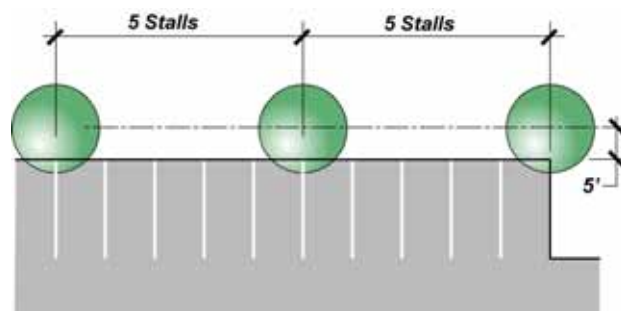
Typical tree layout at parking lot perimeter.
